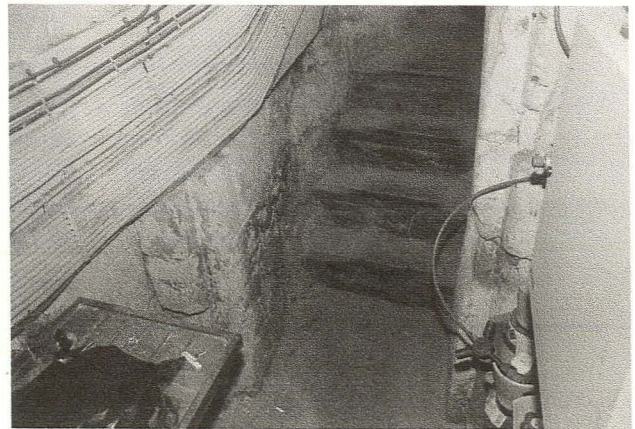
Base of Stairs to Cellars under Archway Range, looking east
